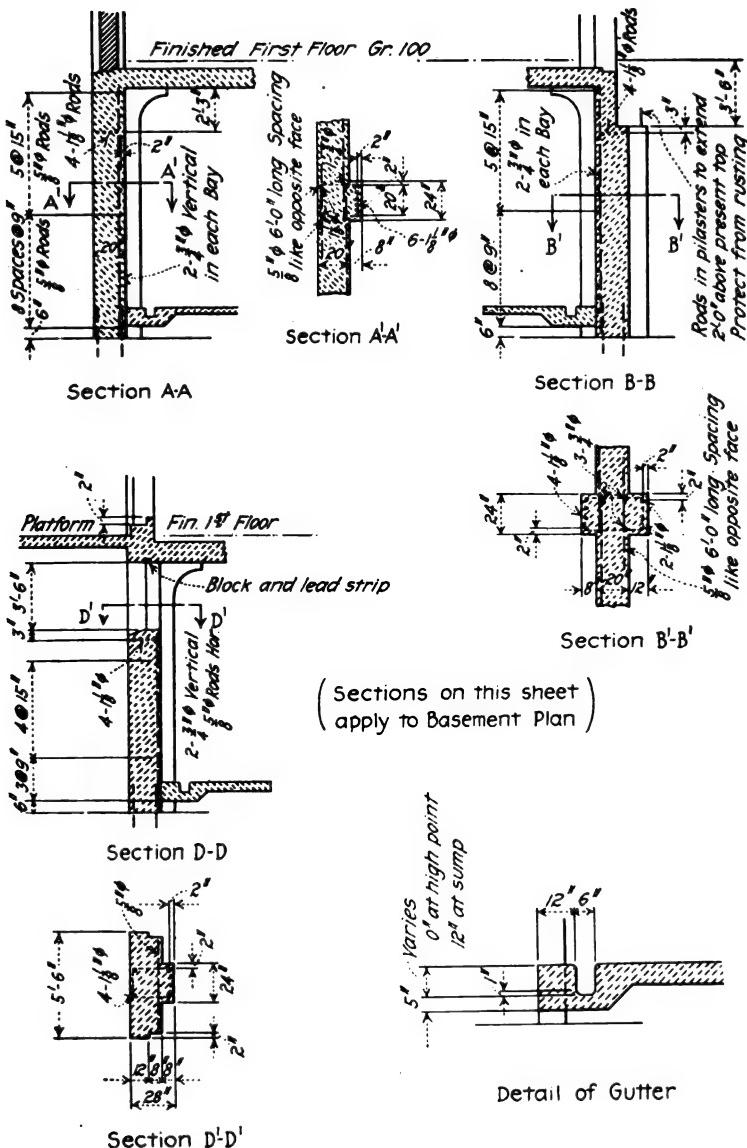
D.—Winchester Repeating Arms Co.'s building, New Haven, Conn.
